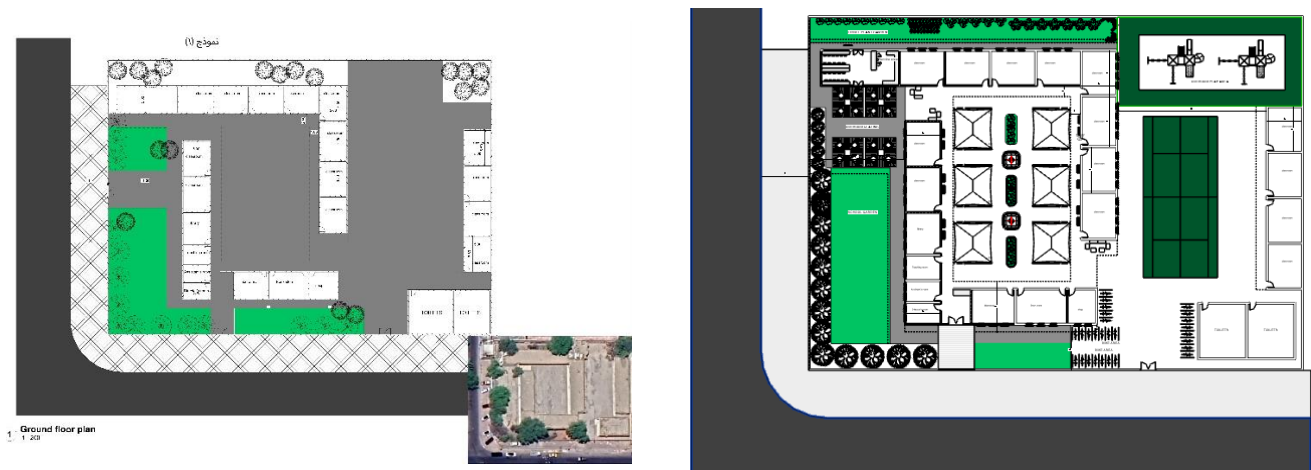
The Open Central Courtyard Model: Site Plan (Google Earth), Ground Floor Plan Before Modification and After Modification (Source: Authors).
